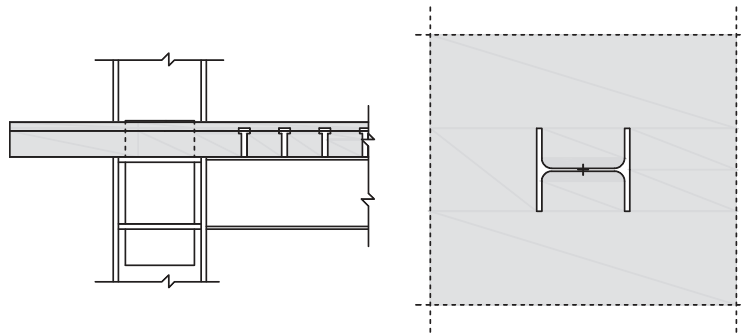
Typical steel-concrete compound joint (slab in contact with the column)
